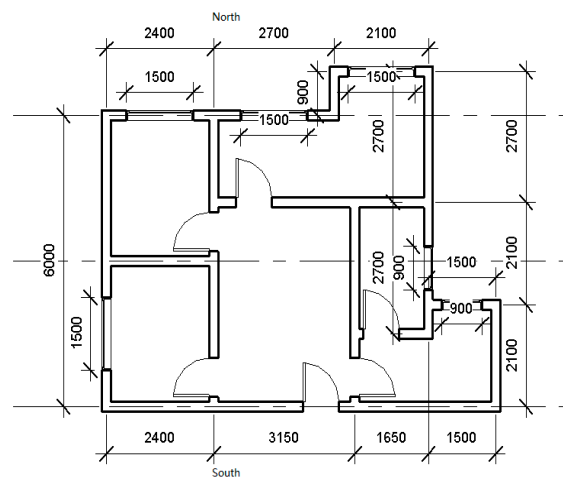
Layout of a prototype and its floor layout in Hong Kong [17].
